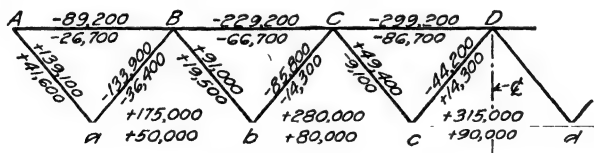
Maximum and minimum stresses, deck Warren truss, dead load and uniform live load.
